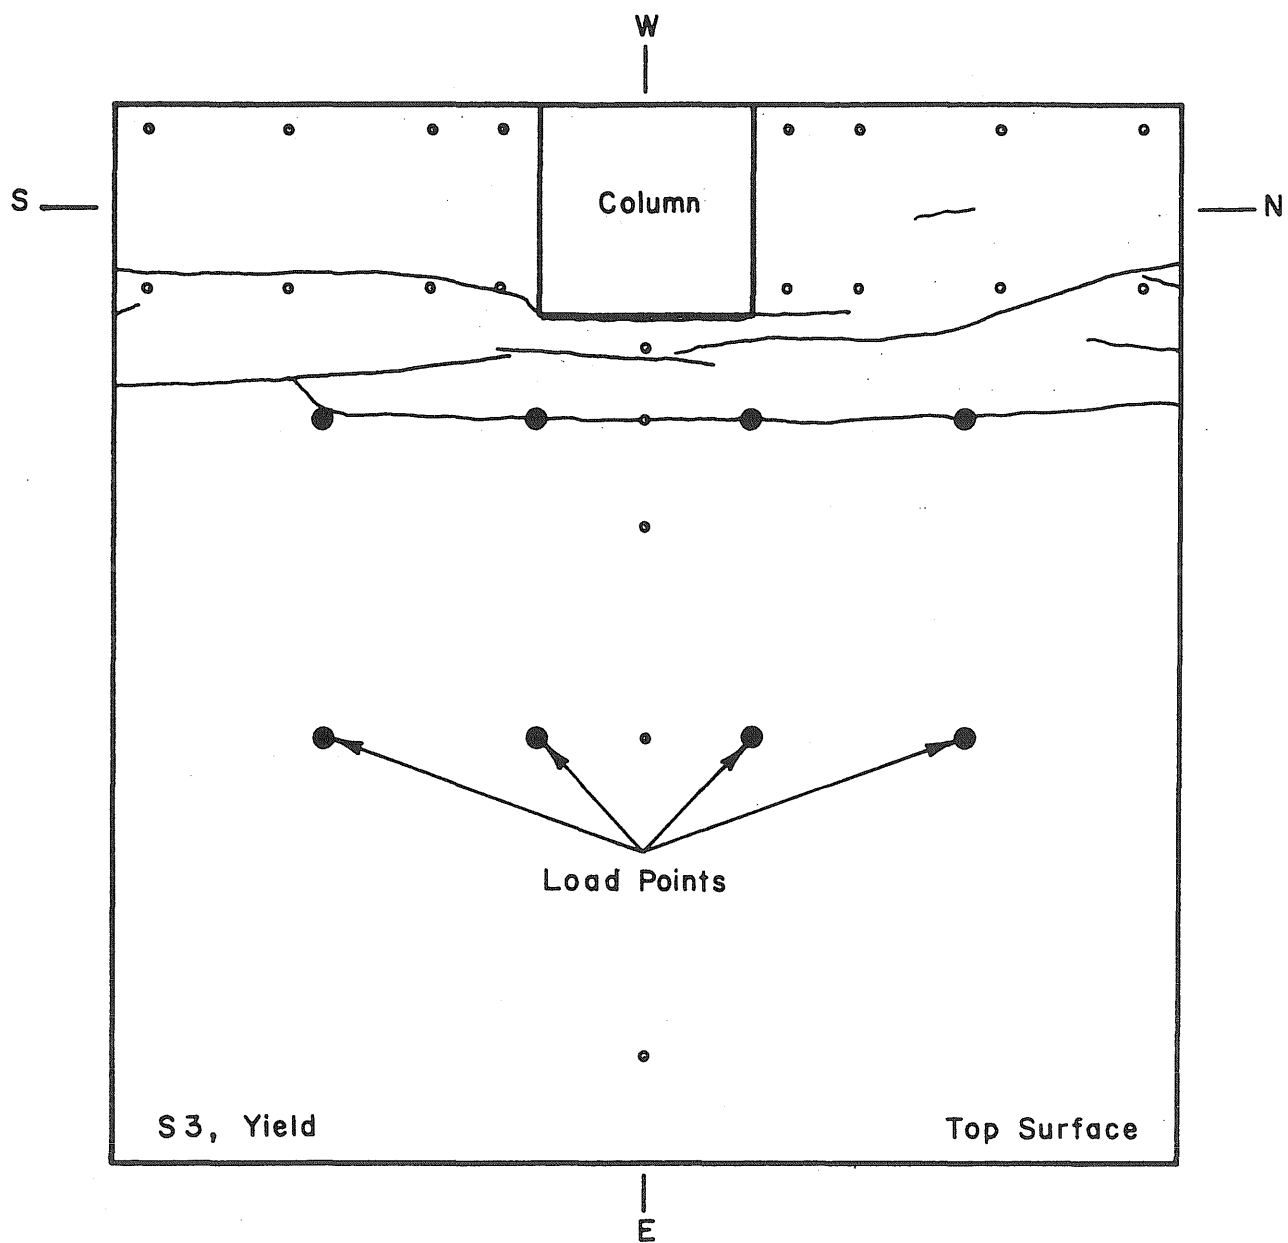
Crack Pattern at Yield on the Top Surface of Specimen S3
